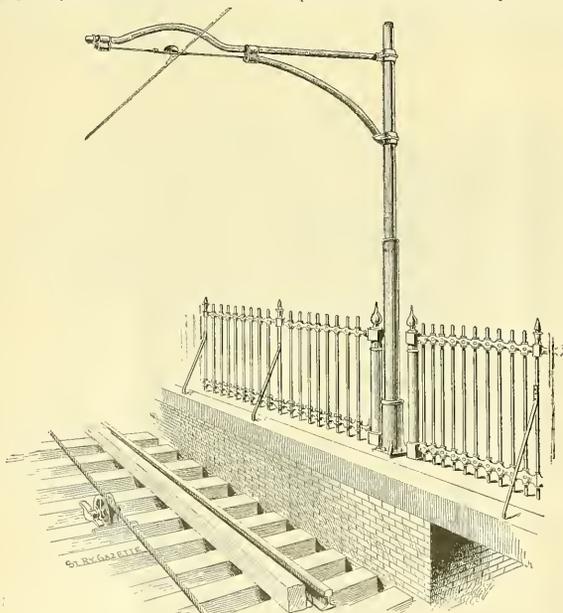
TUBULAR POLES USED ON BRIDGE APPROACHES.
